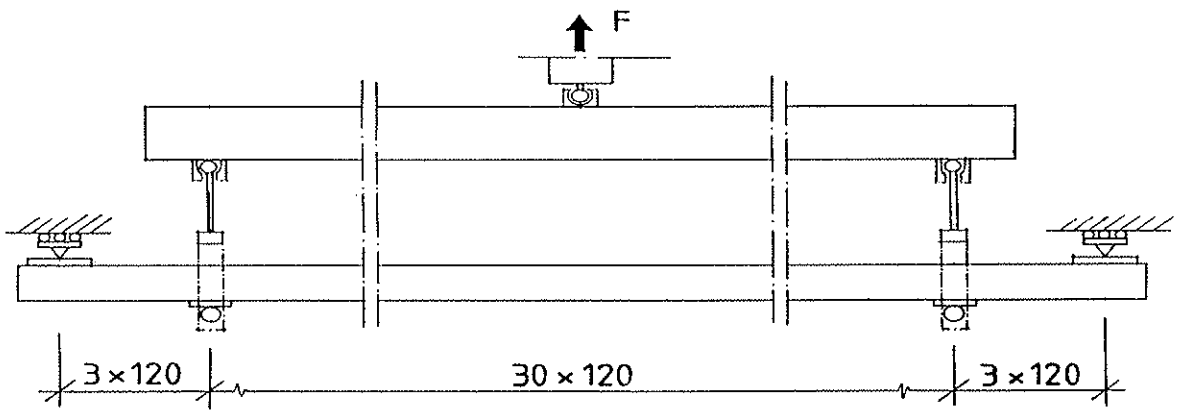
Principal test arrangement when timber members containing many weak zones were tested. All sizes in mm.
